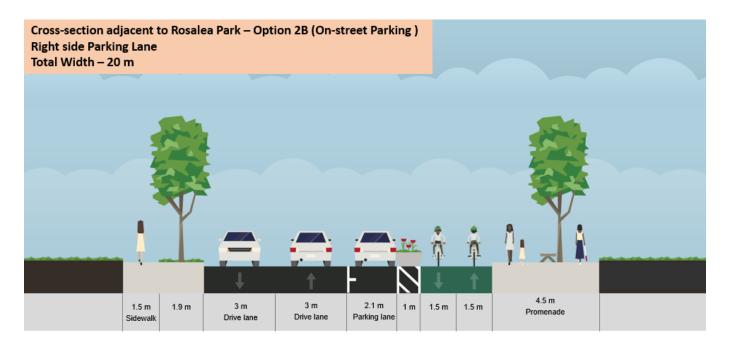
PROPOSED CONCEPT – CONVENTIONAL MULTIMODAL STREET CROSS-SECTION
